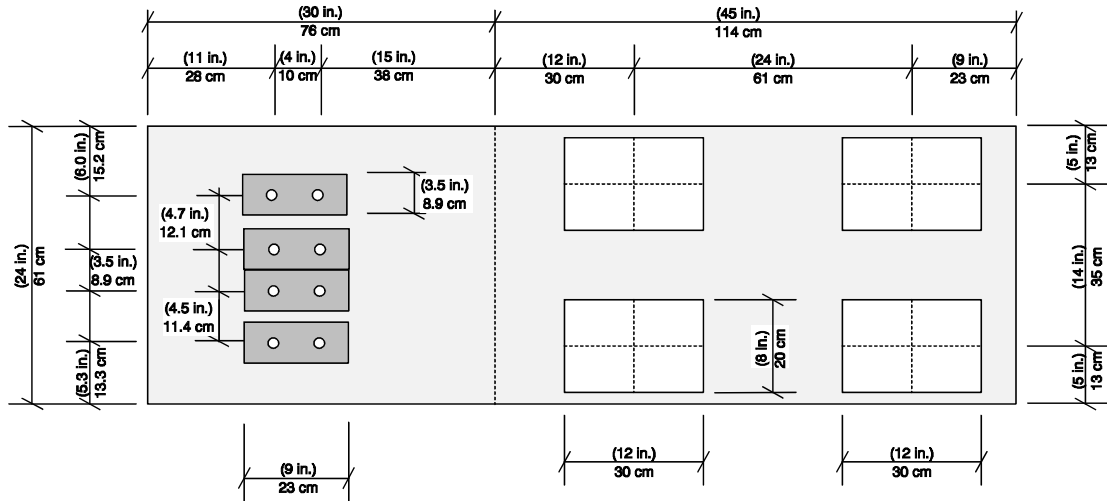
Plan View of Location of Post-Tensioning Bars
